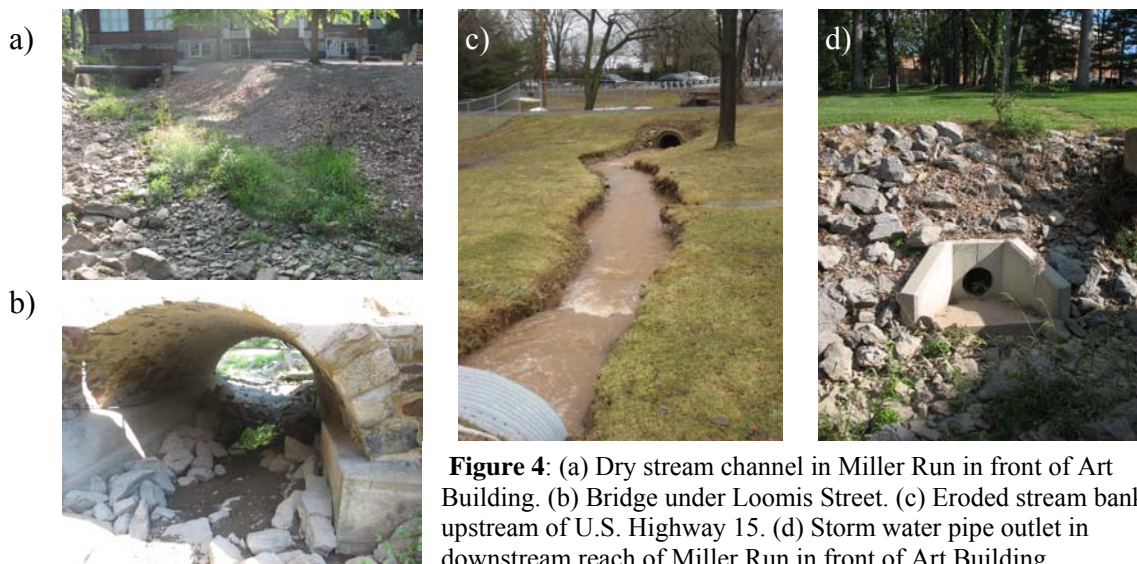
(a) Dry stream channel in Miller Run in front of Art Building. (b) Bridge under Loomis Street. (c) Eroded stream banks upstream of U.S. Highway 15. (d) Storm water pipe outlet in downstream reach of Miller Run in front of Art Building.
